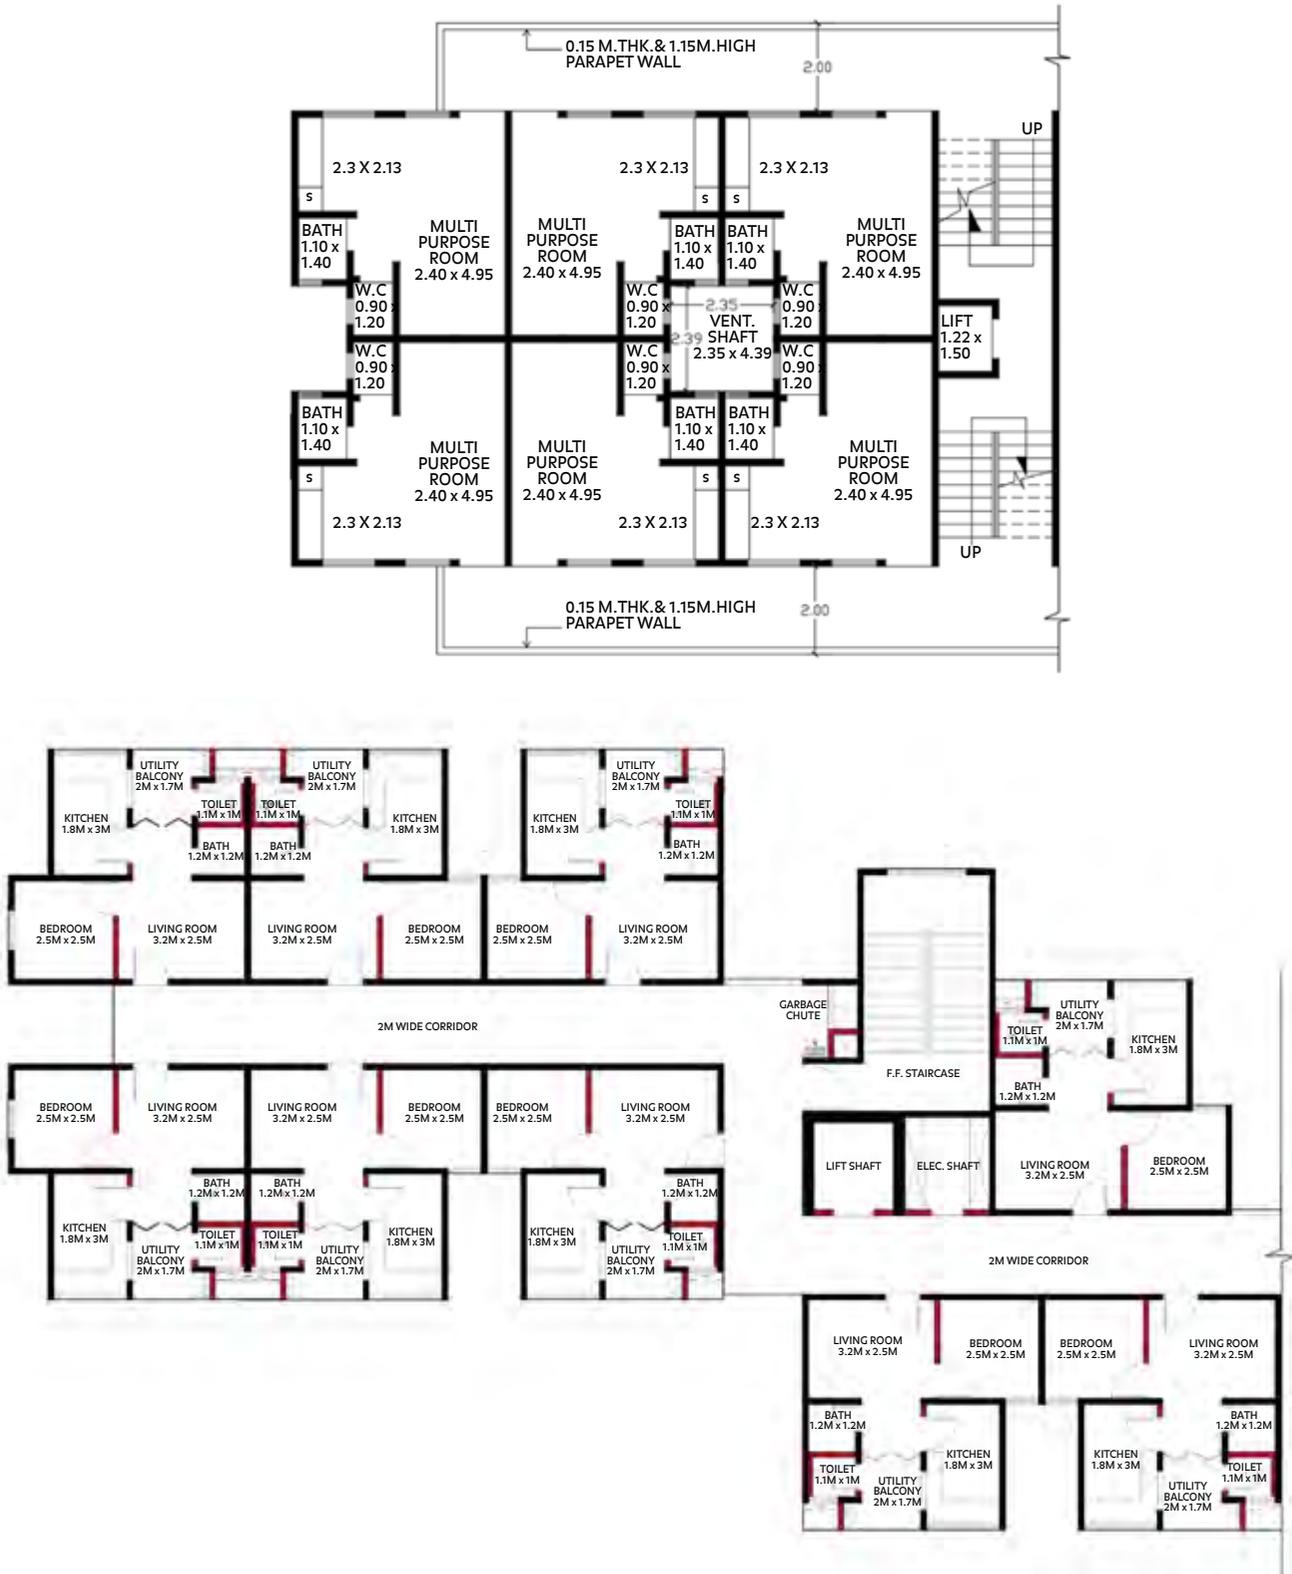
Typical floor plans of Natwar Parekh colony (Top: existing and below: redesigned)
